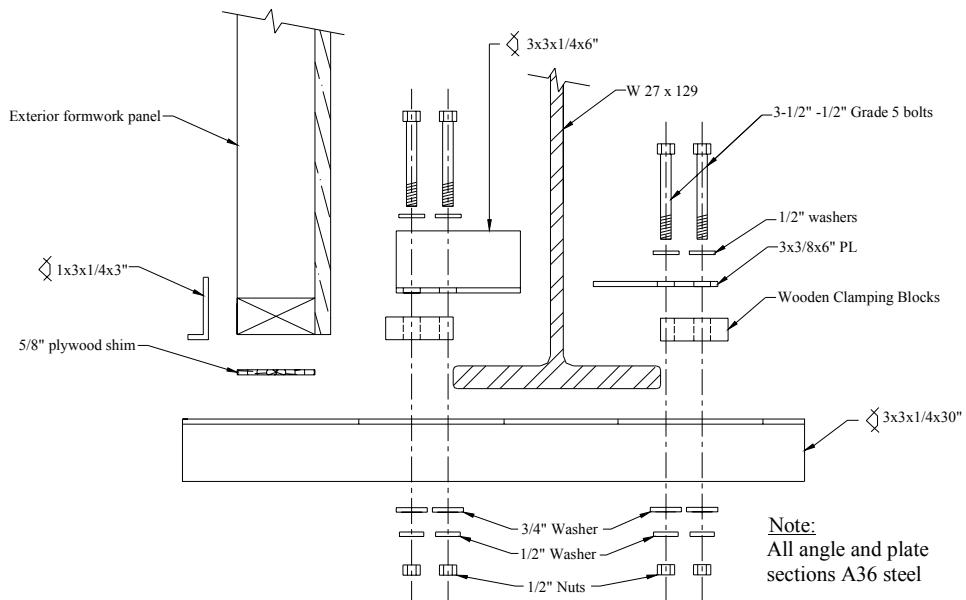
Wooden spacer block for securing the custom rolled arched formwork.
